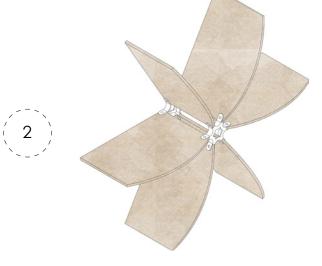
FRONT ELEVATION J6: 6-Point Display Joint Connection Not to Scale
